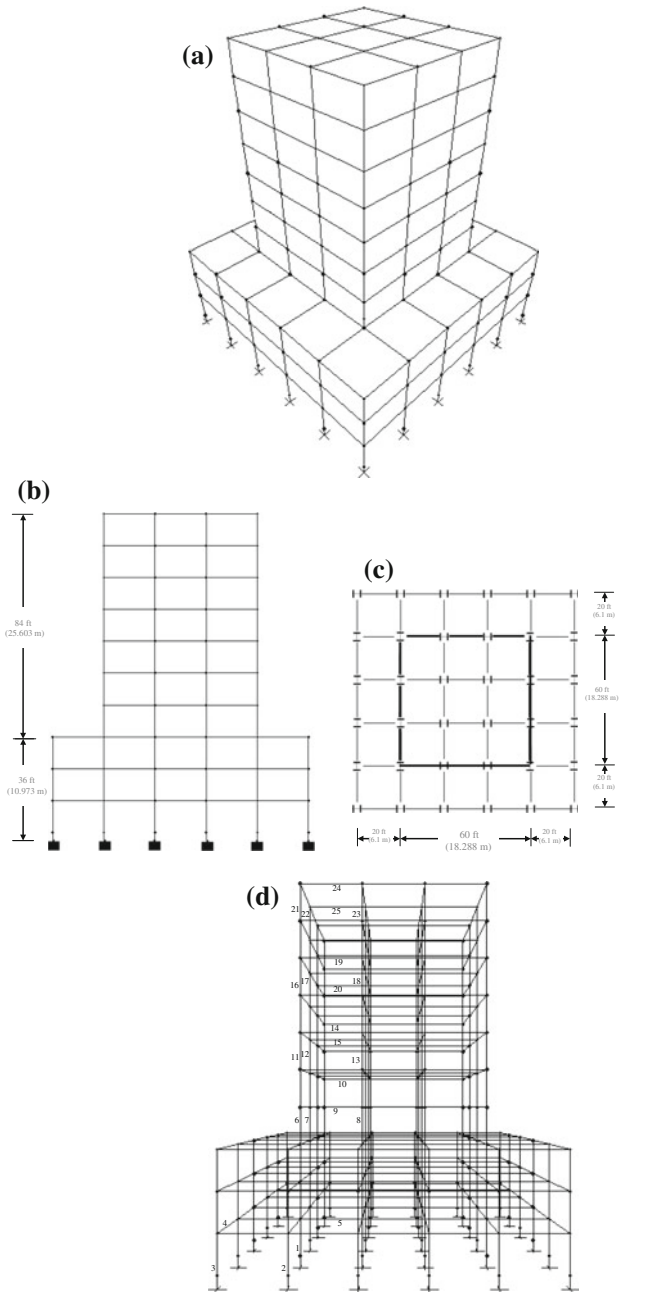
568-member unbraced space steel frame. a 3D view. b Elevation view. c Plan view. d Member grouping
